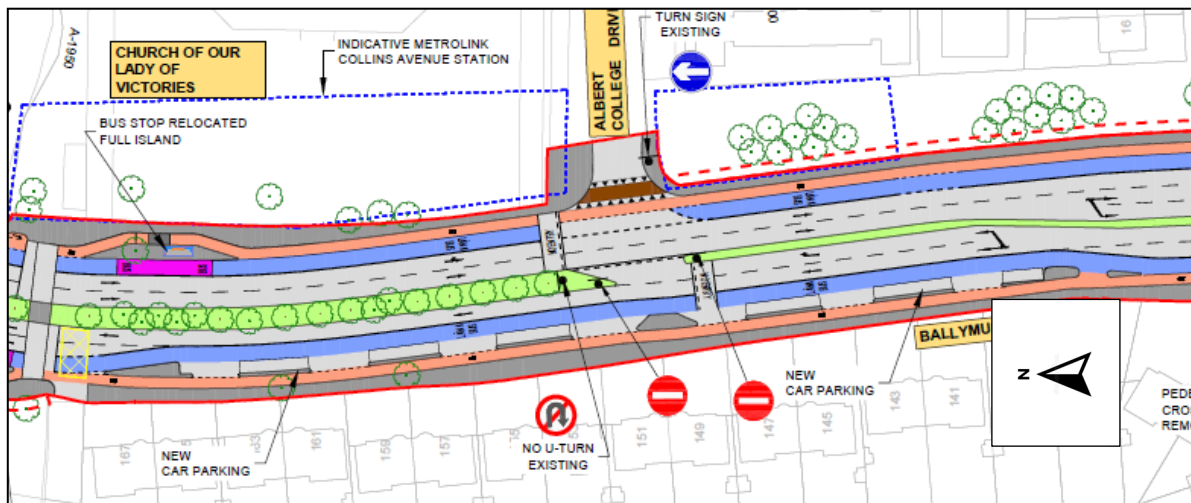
Extract from General Arrangement Drawing Sheet 6 at Our Lady of Victories Church
